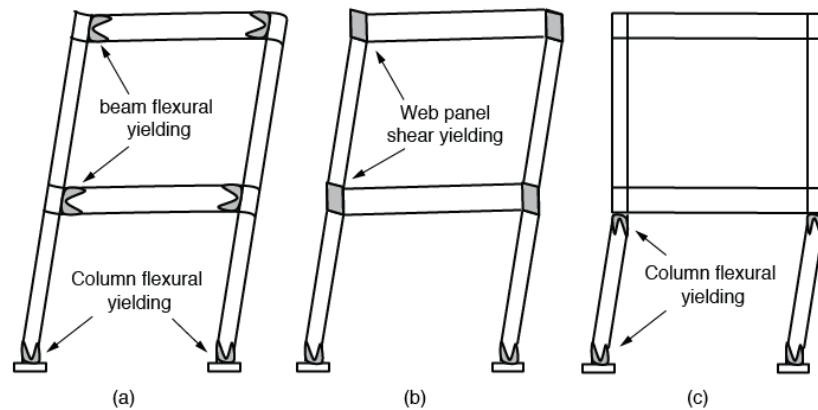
Steel MRF system under lateral load – Deformation kinematics and potential collapse mechanisms
